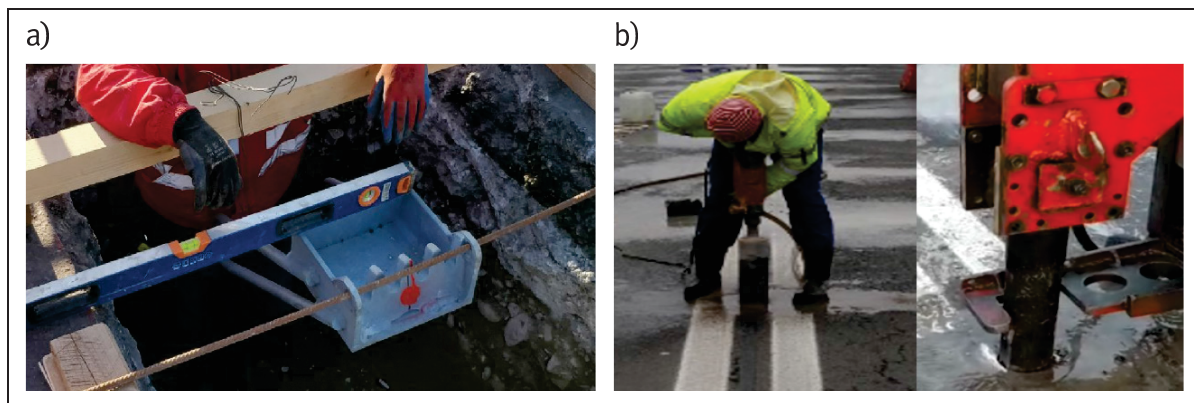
a) Existing road structure and anchor device; b) The post fastening procedure
